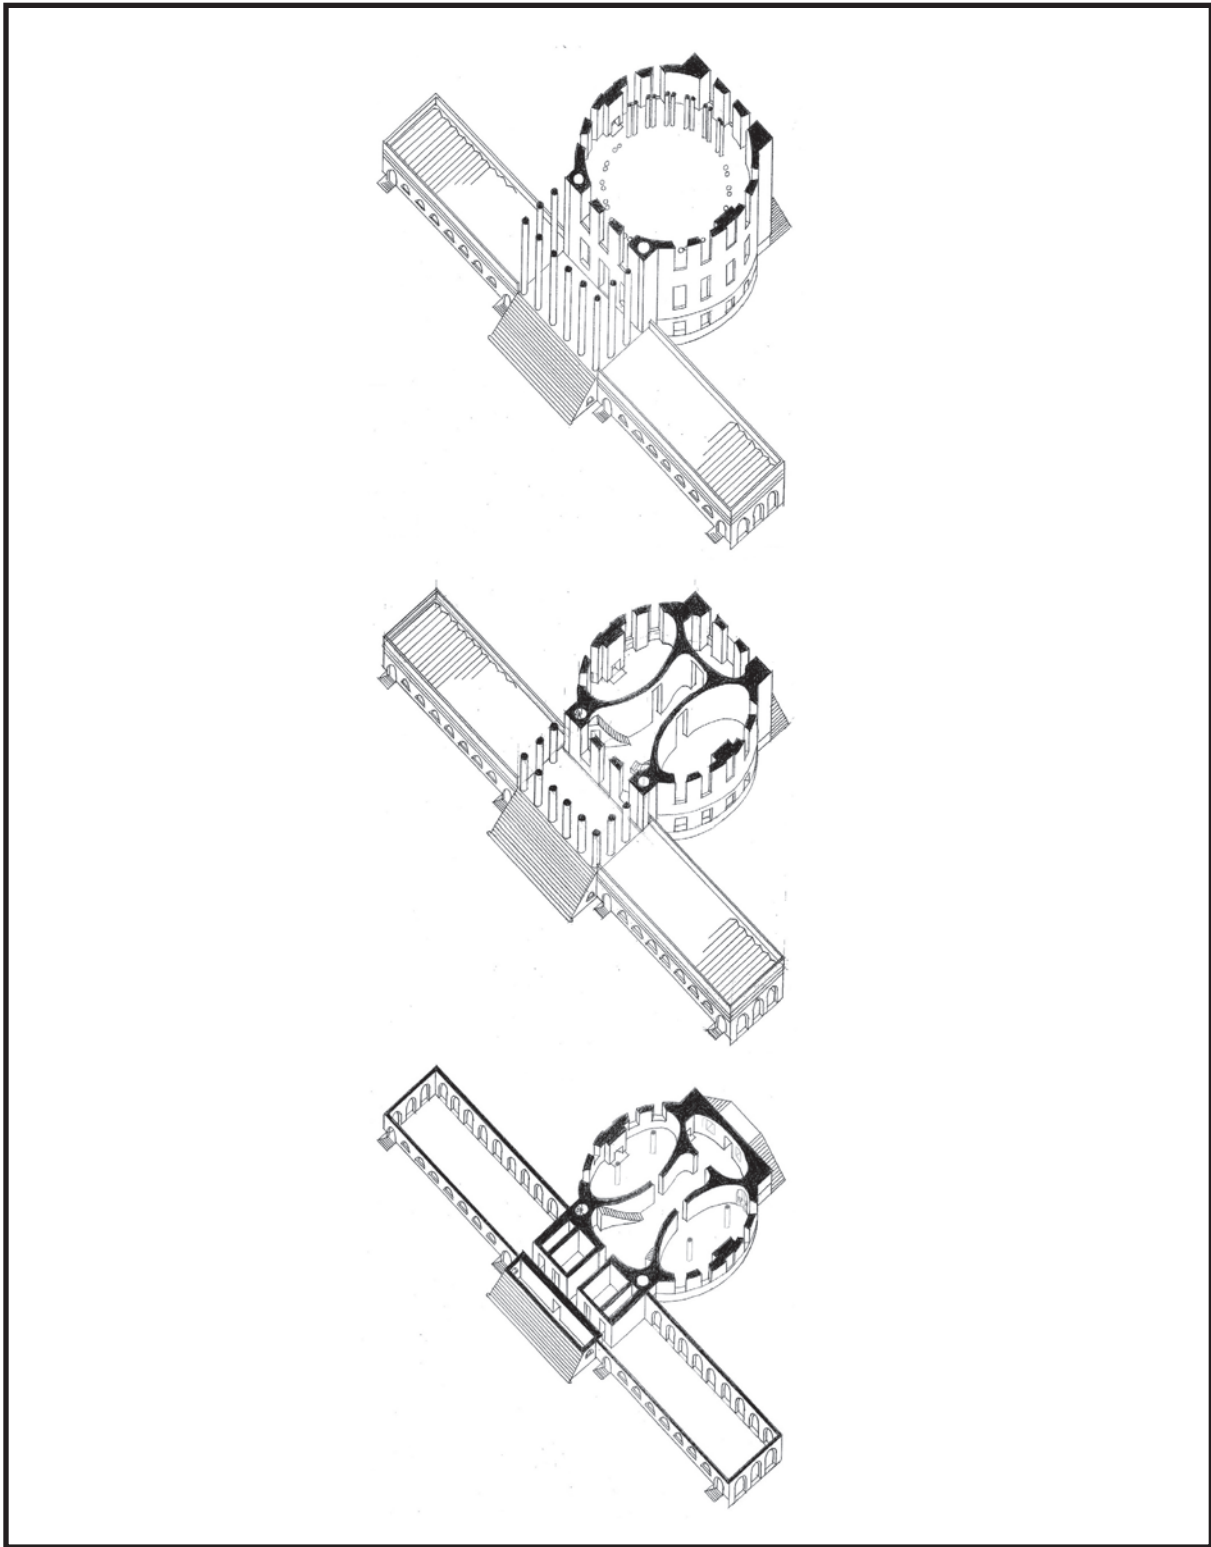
Sketch axonometrics of the original Rotunda and terraces in 1827, showing the ground floor, main floor, and Dome Room. Drawings by John G. Waite Associates, Architects, 2022.
